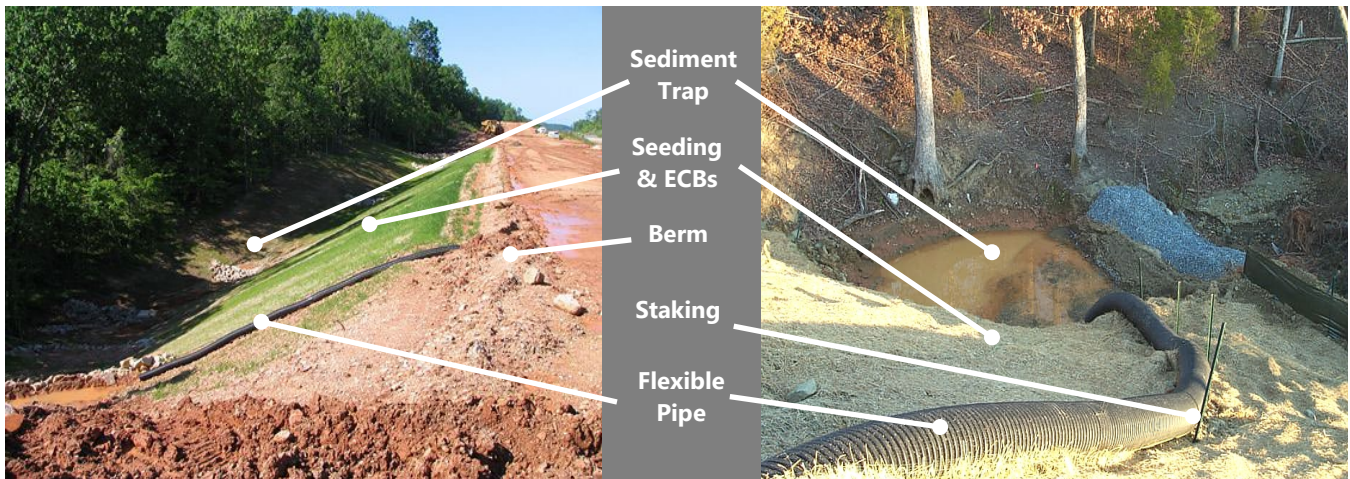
Berm-and pipe drain can be used when diverting water down a slope in the process of being stabilized.
